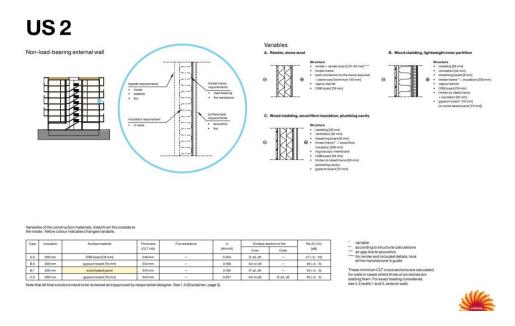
Non-load bearing external wall (Stora Enso, 2016)
